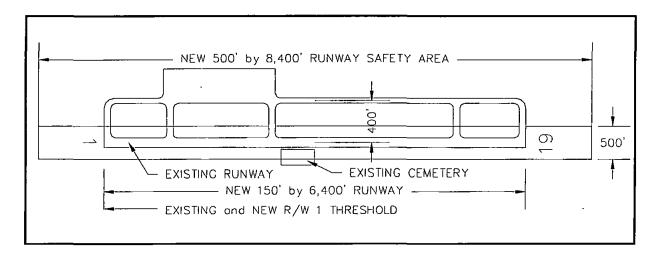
; ALTERNATIVE C - PLAN VIEW LAYOUT
